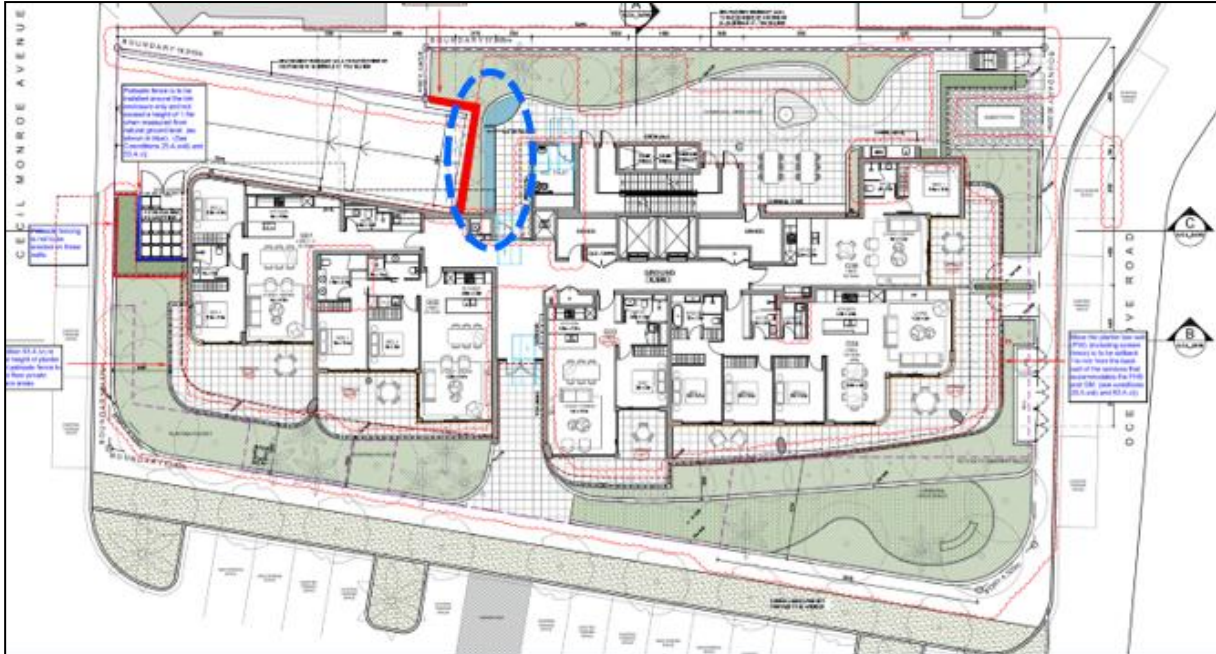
MA21/0080 approved ground floor plan (source: MA21/0080 approved plans)
